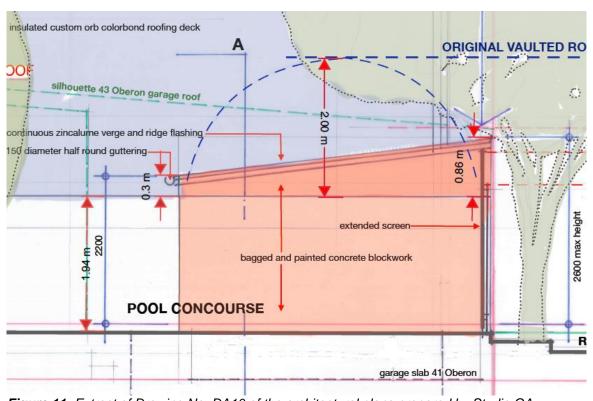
Extract of Drawing No. DA10 of the architectural plans prepared by Studio GA.
